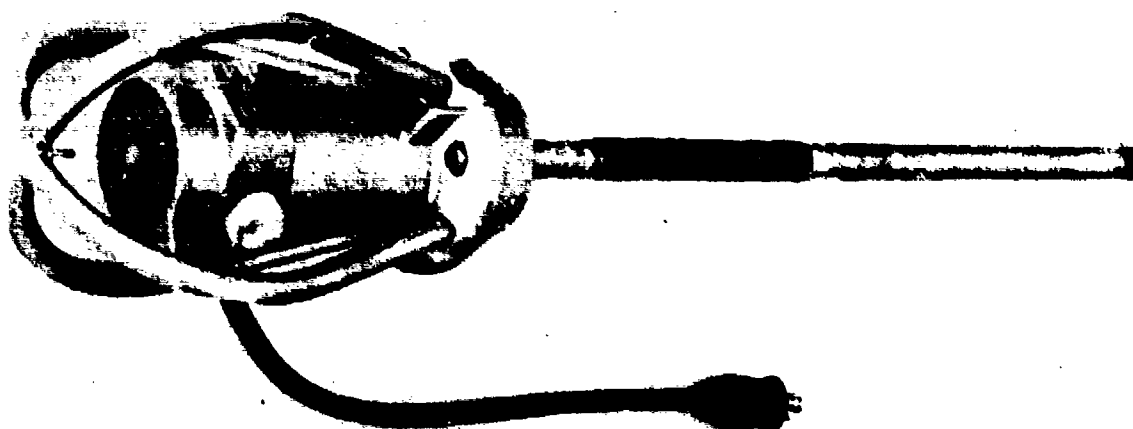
Typical commonly used internal post type vibrator (Courtesy of American Concrete Institute)
